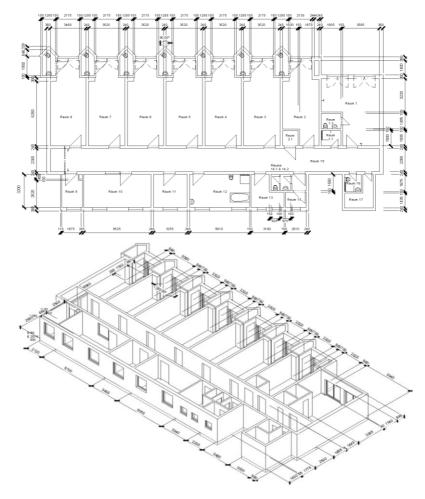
Case study 2 (2. floor of hospital) with modeled floor plan based on manually audited building elements represented in Autodesk Revit (top: floor plan; bottom: 3D view in isometric projection¹⁴)
